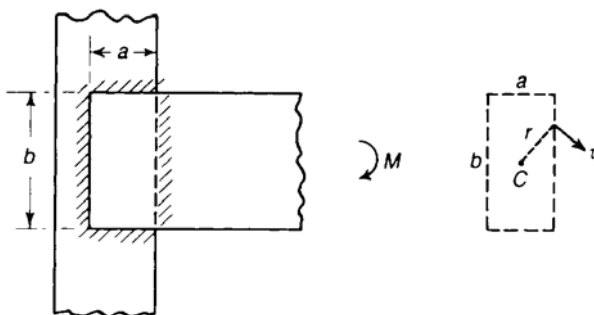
A plate fillet welded to a column, and transmitting a bending moment M .
